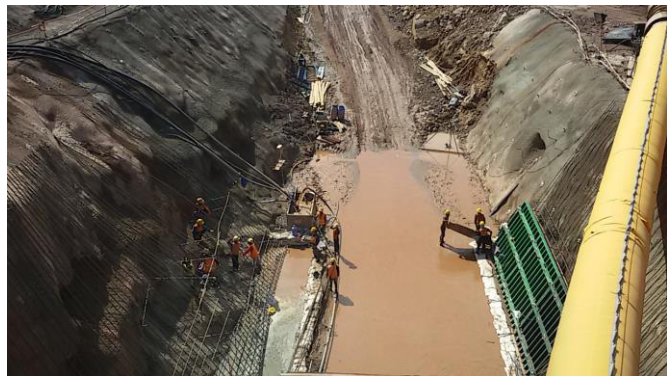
Pooled effluent water at the tunnel outlet excavation site (April, 2015). The filtration system in the adjacent photo is situated on the upper left bank of the tunnel excavations. The trapped effluent water is tanked and then pumped to sediment ponds before passing through the filtration system. Sediment 'cake' is disposed of at Spoil Area 6. Processed effluent water is discharged to the Nam Ngiep.
